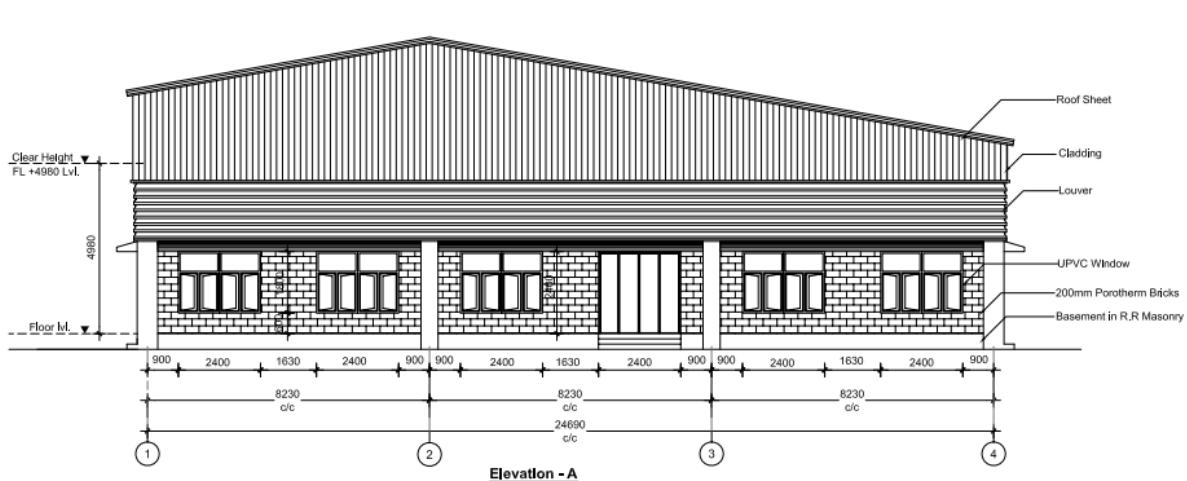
Side elevation of one of the loom sheds: note the ‘apex’ roof structure, use of natural light and 200mm porotherm bricks
